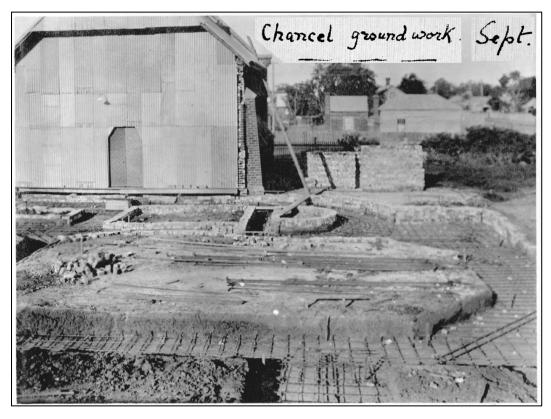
Shallow, reinforced concrete footings constructed in the 1920s (Source: St Ambrose archives)
